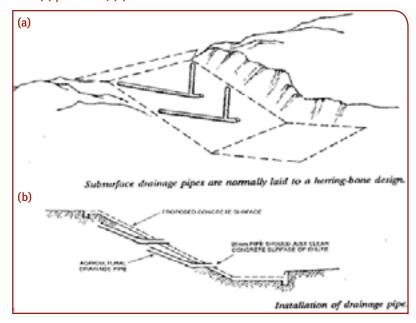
Subsurface drainage of a chute: (a) plan view; (b) section view
